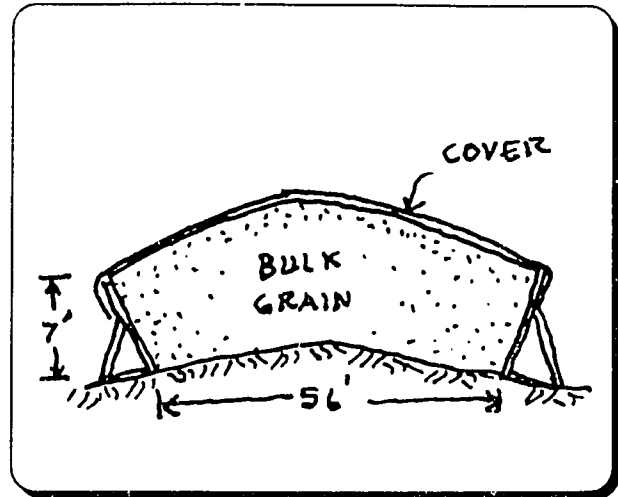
Schematic drawing of a covered bulk storage facilities used in Pakistan.
